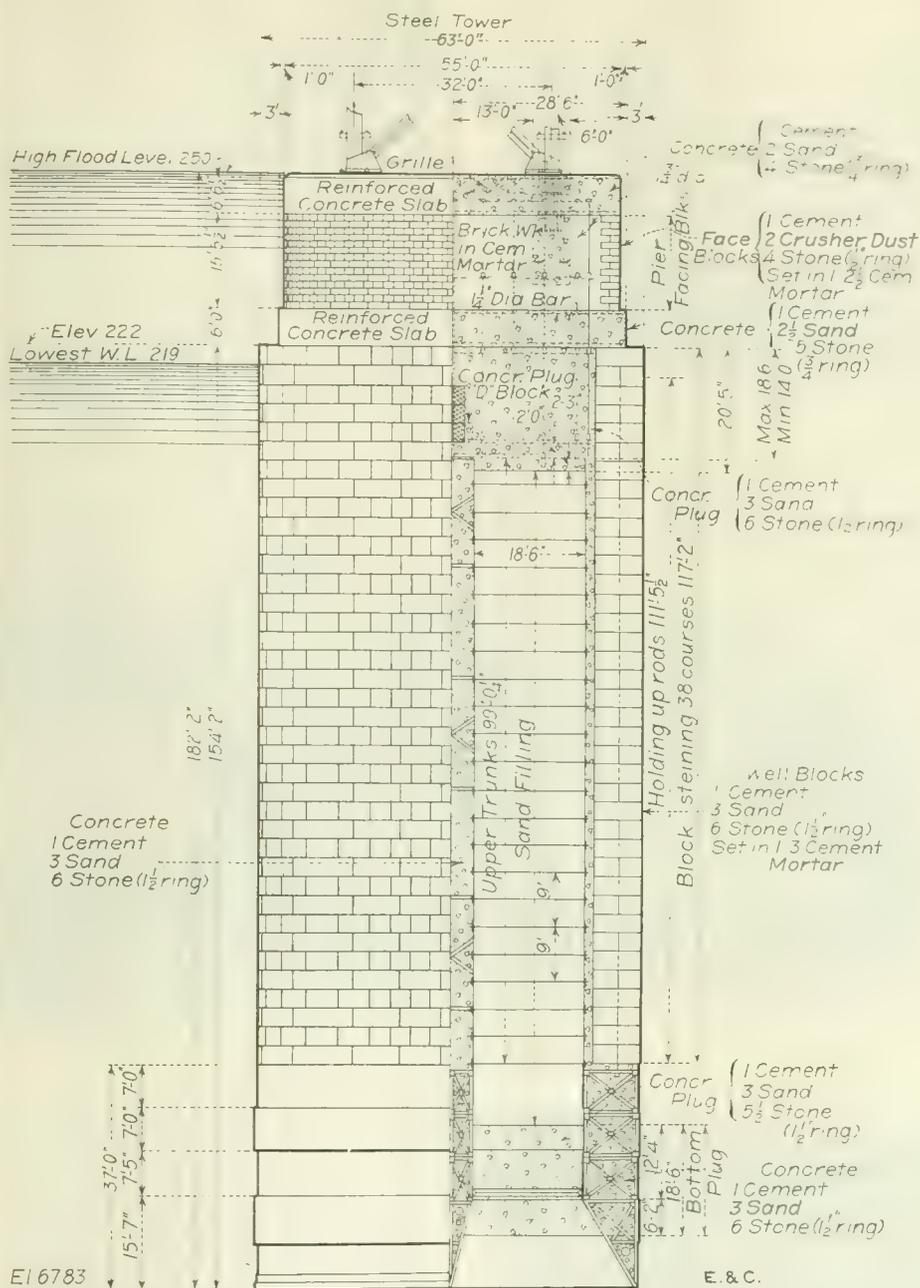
Half Elevation and Half Longitudinal Section of Typical Caisson and Masonry Portion of Pier for 345-ft. 1/2-in Truss Spans of Lower Ganges Bridge.
